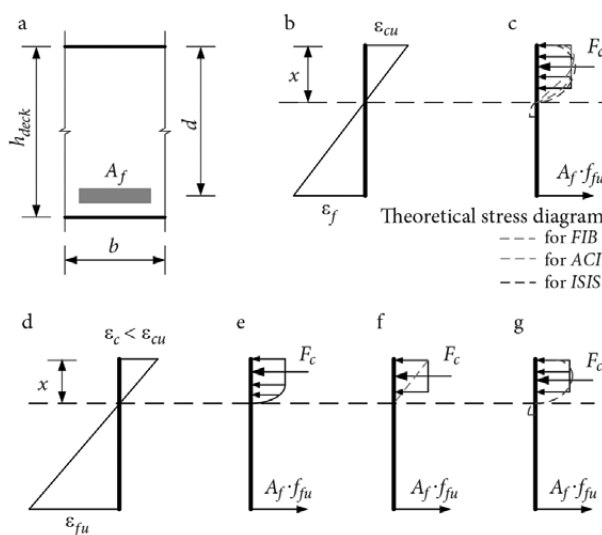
Design scheme: a – deck cross section; b – strain distribution at compression failure condition; c – design stress distribution at compression failure condition; d – strain distribution at tension failure condition; e – design stress distribution at tension failure condition for FIB, f – for ACI, g – for ISIS
